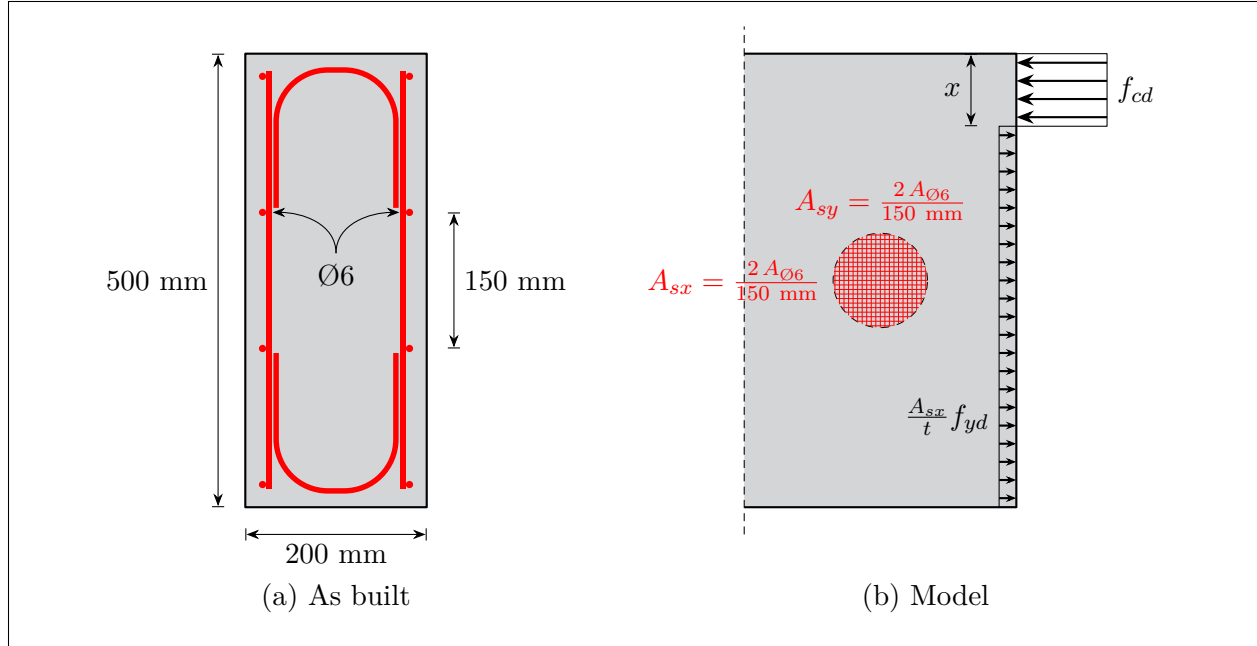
Cross section of the beam (a), reinforcement in model and plastic stress distribution (b).
